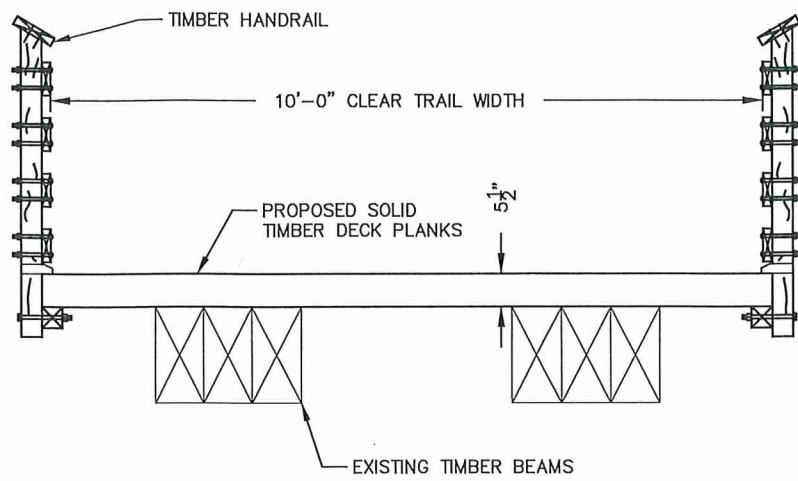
TIMBER DECK ON TIMBER BEAM SPANS (OPTIONS 1 & 2)
